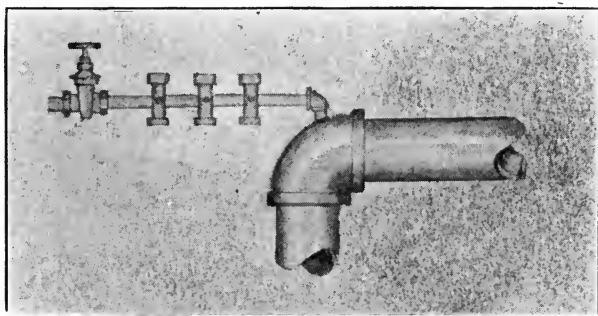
Air Valve to Relieve a Fitting and Line of Pipe from Air.
